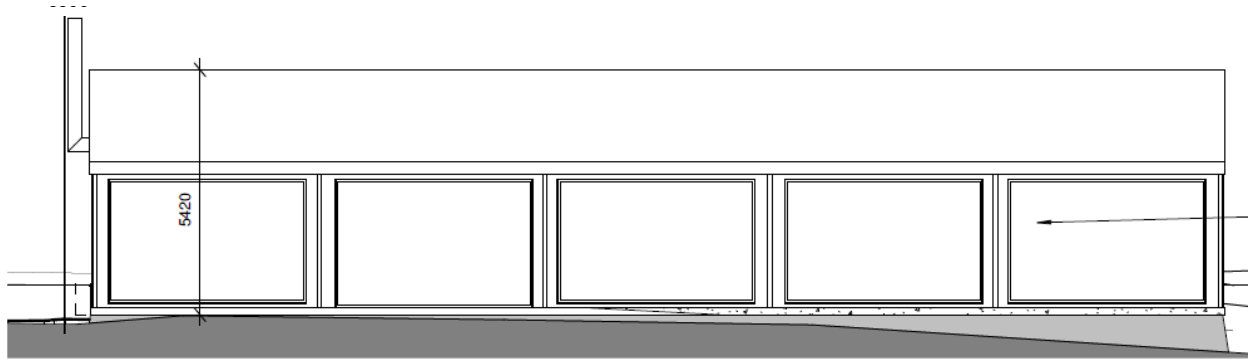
Proposed kitchen and dining hall elevation (south eastern elevation)
